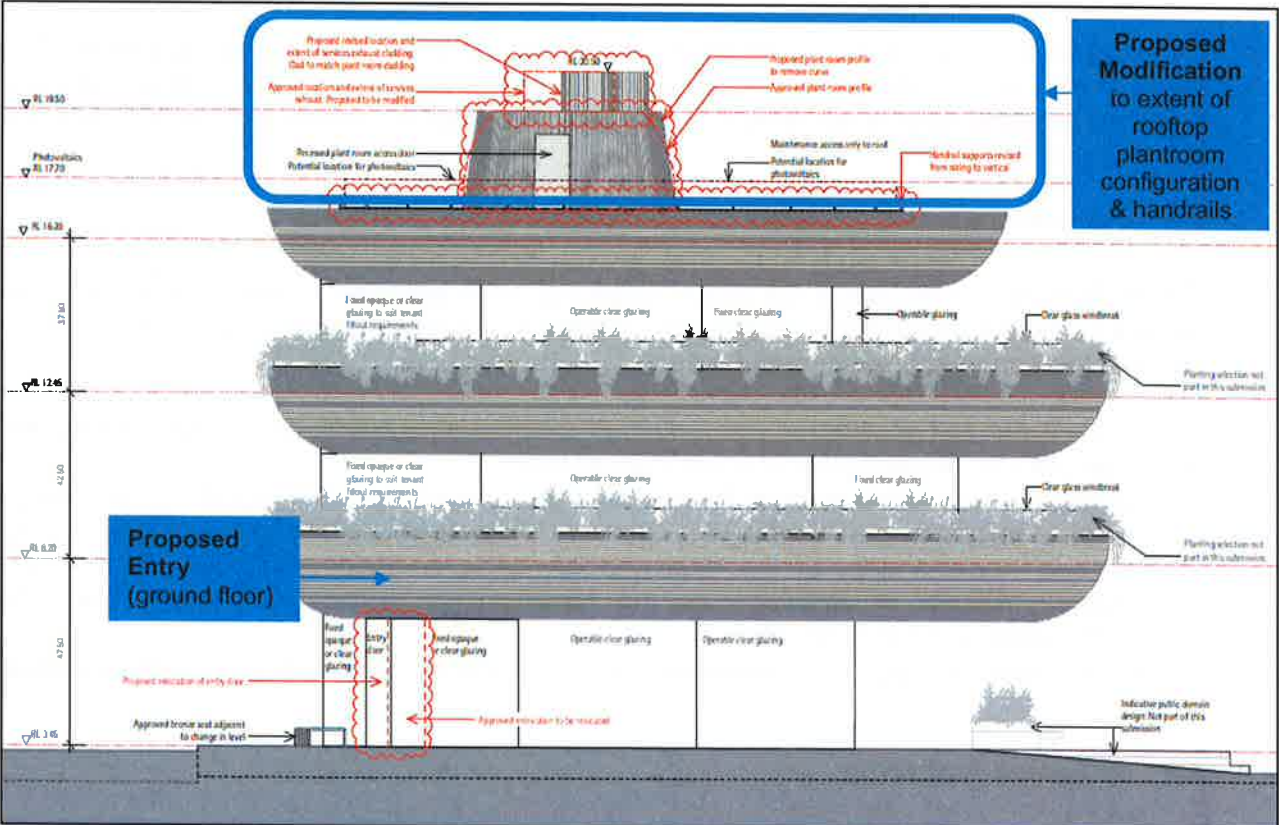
Proposed Northern Elevation showing the relocation of the entry door and modification to the plantroom (Source: Applicant's architectural drawings).
